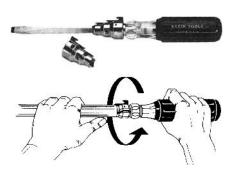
Conduit reamer fits onto standard screwdriver. (Klein)
